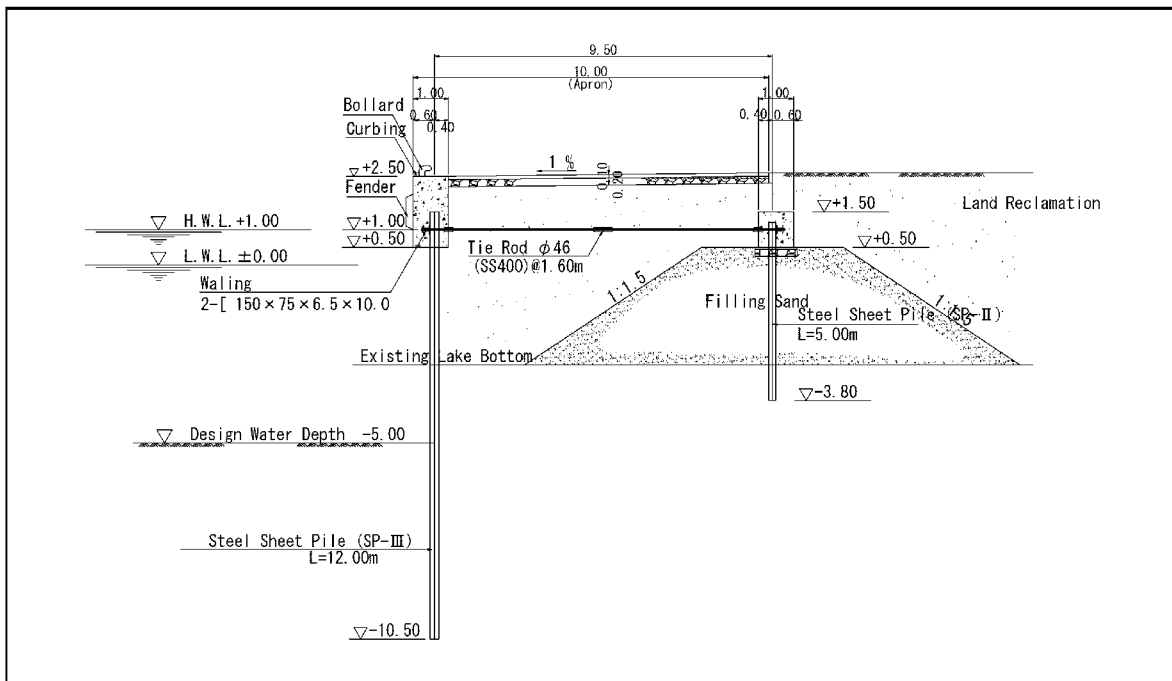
Comparative Cross Section of Steel Sheet Pile Type Berth Structure
